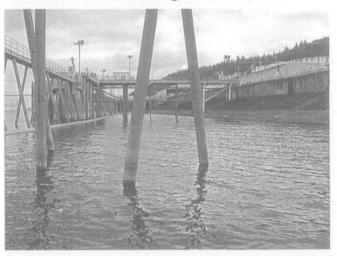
North side of ARCO pier looking south. Iron oxide staining emanating from cracks and seams in concrete retaining wall. Sandy and rocky beach at base of retaining wall. No visible seepage observed.
